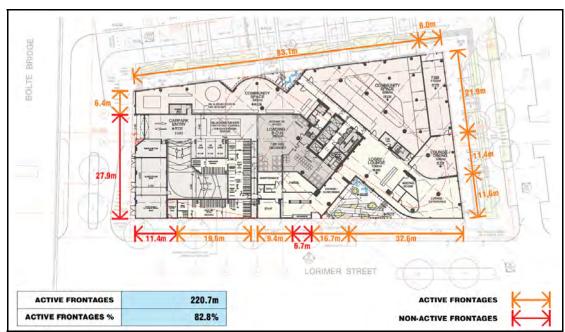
Location of active and non-active frontages generally consistent with the Development Plan
